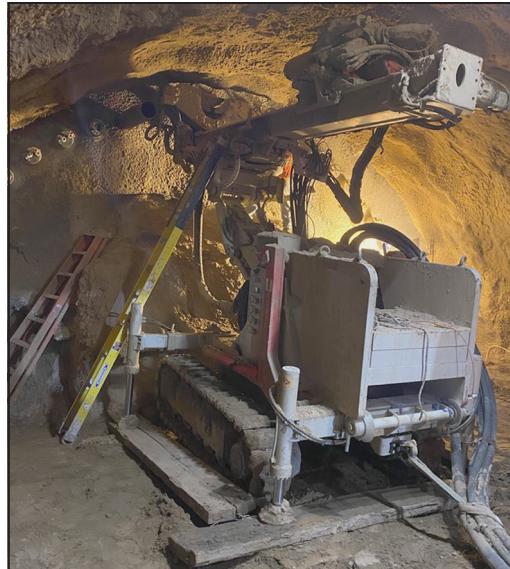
Setup of canopy pipe installation drill rig at STA 00+77
